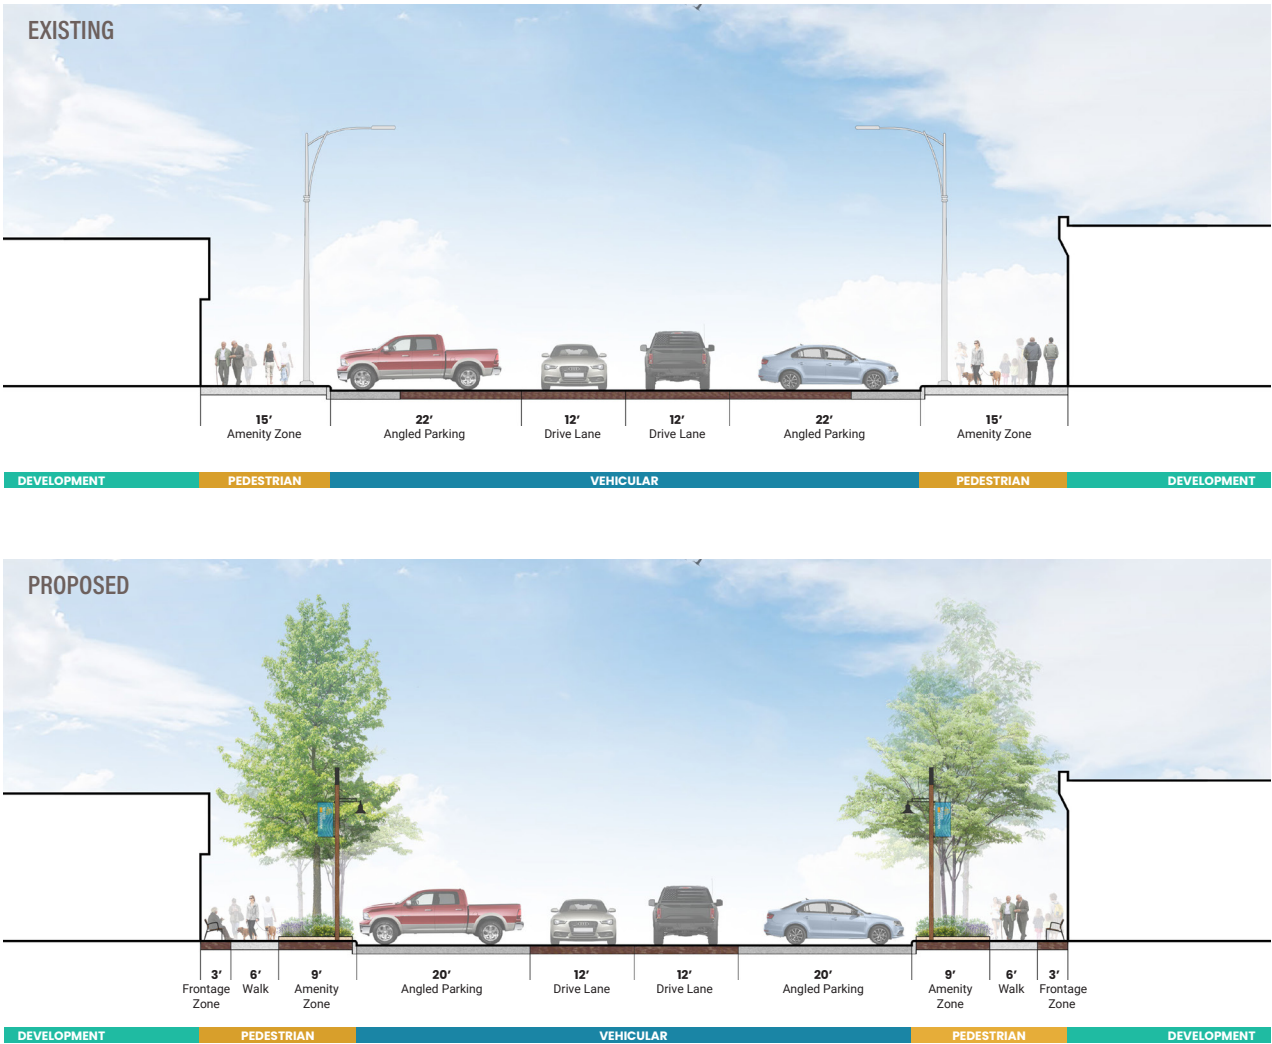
/ EXISTING AND PROPOSED SECTIONS OF 1ST STREET IN DOWNTOWN MILFORD
